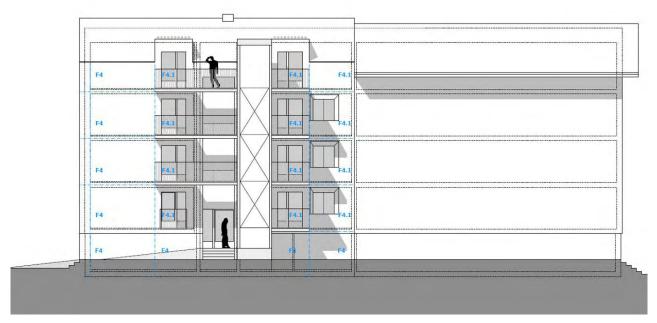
Northeast elevation (Entrance façade with new elevator and access balconies)
